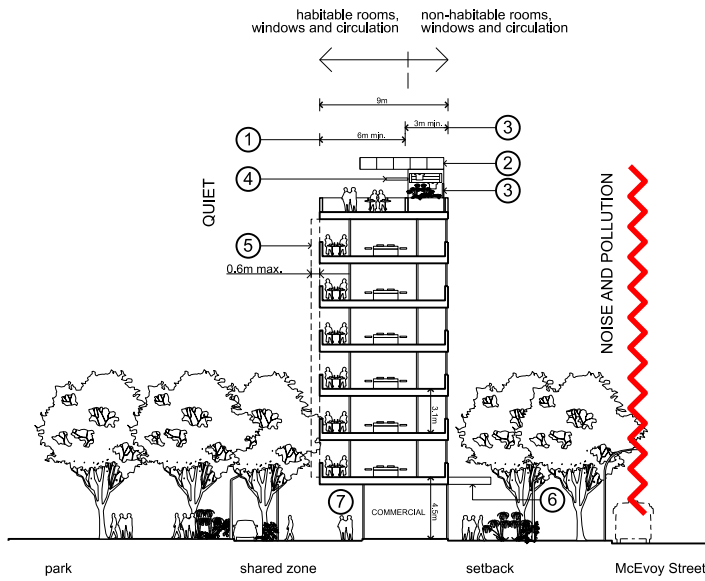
Buildings fronting Cooper Park and McEvoy Street
